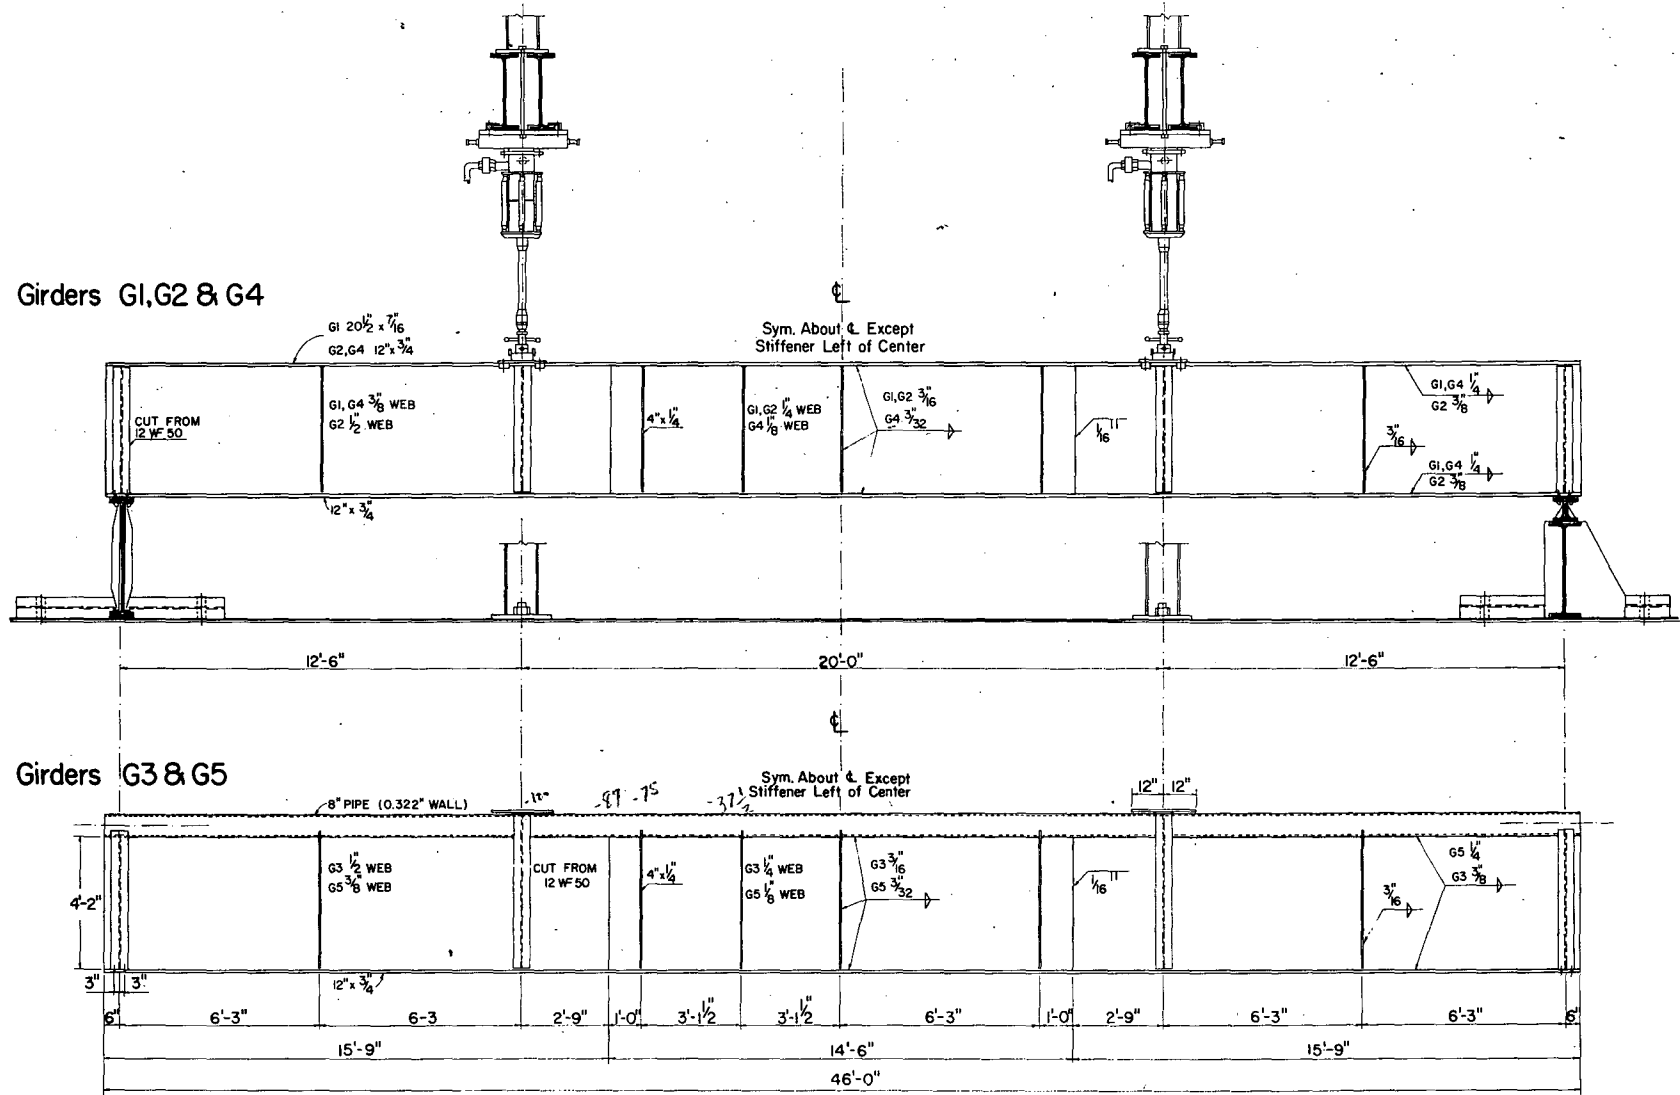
Plate Girders G1, G2, G3, G4 & G5 with Test Setup
